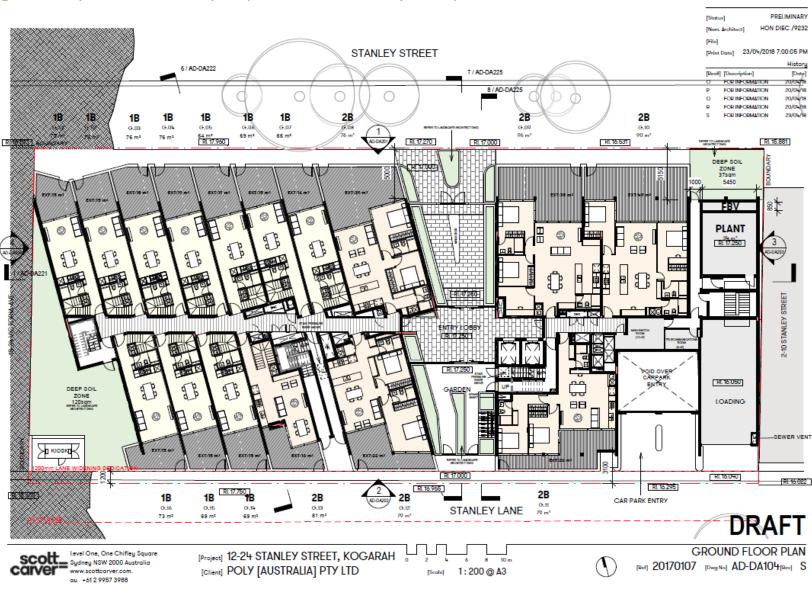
Proposed Ground Floor plan. (Source: Scott Carver, April 2018)
